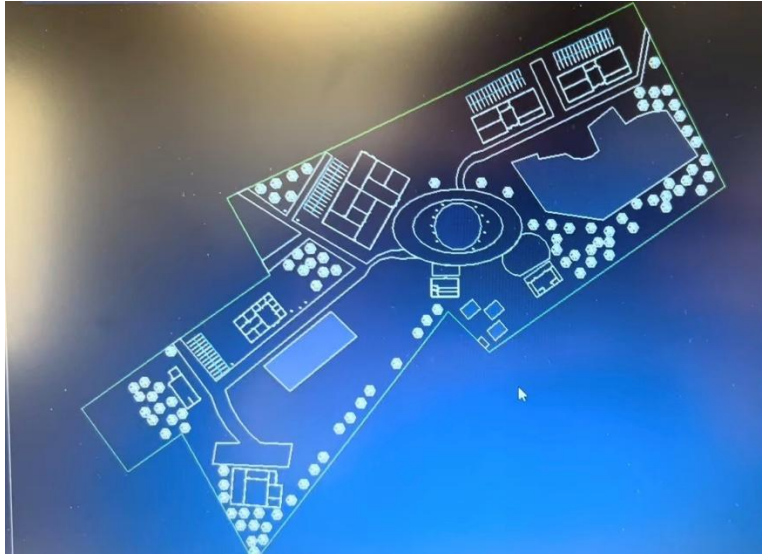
Original full site plan for the college of architecture, art, and sustainability.
